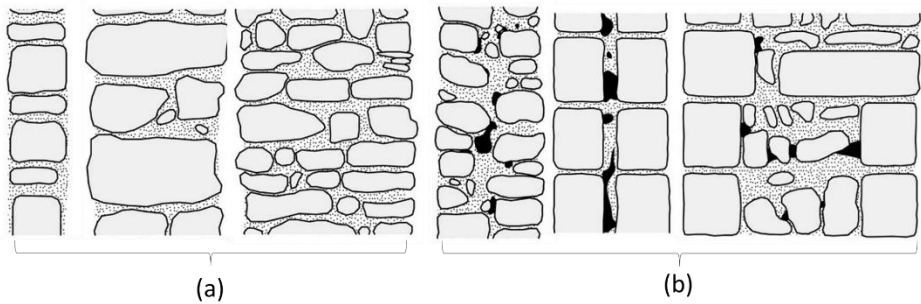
Cross-sections of some masonry walls; a) single leaf; b) multiple leaf masonry walls (Szabó et al., 2023).
